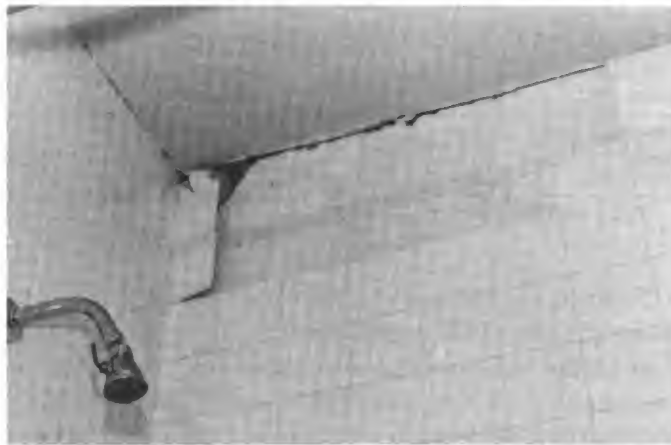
Holiday Inn, Orion Avenue. Damage to tile above bathtub on second floor. John A. Blume & Associates photograph.
